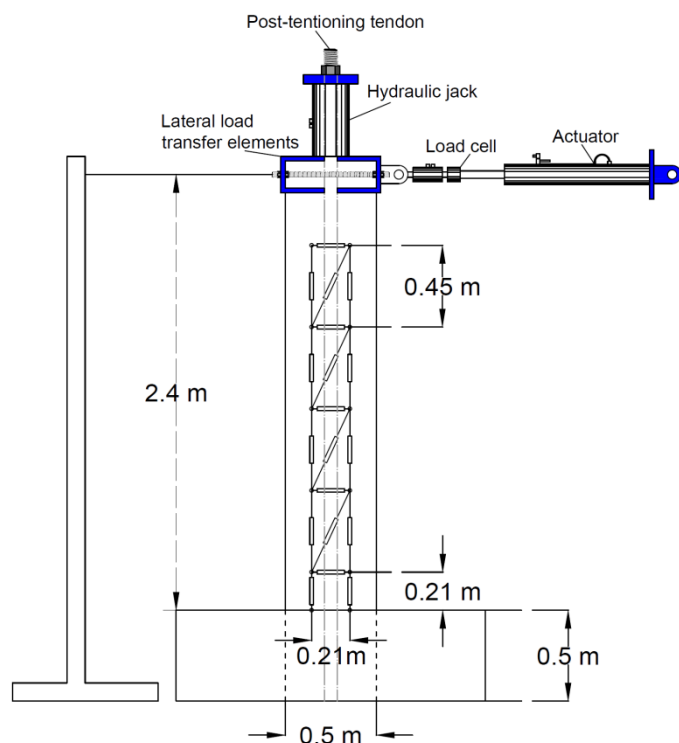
Test set-up for cyclic loading of ECIP bridge pier
